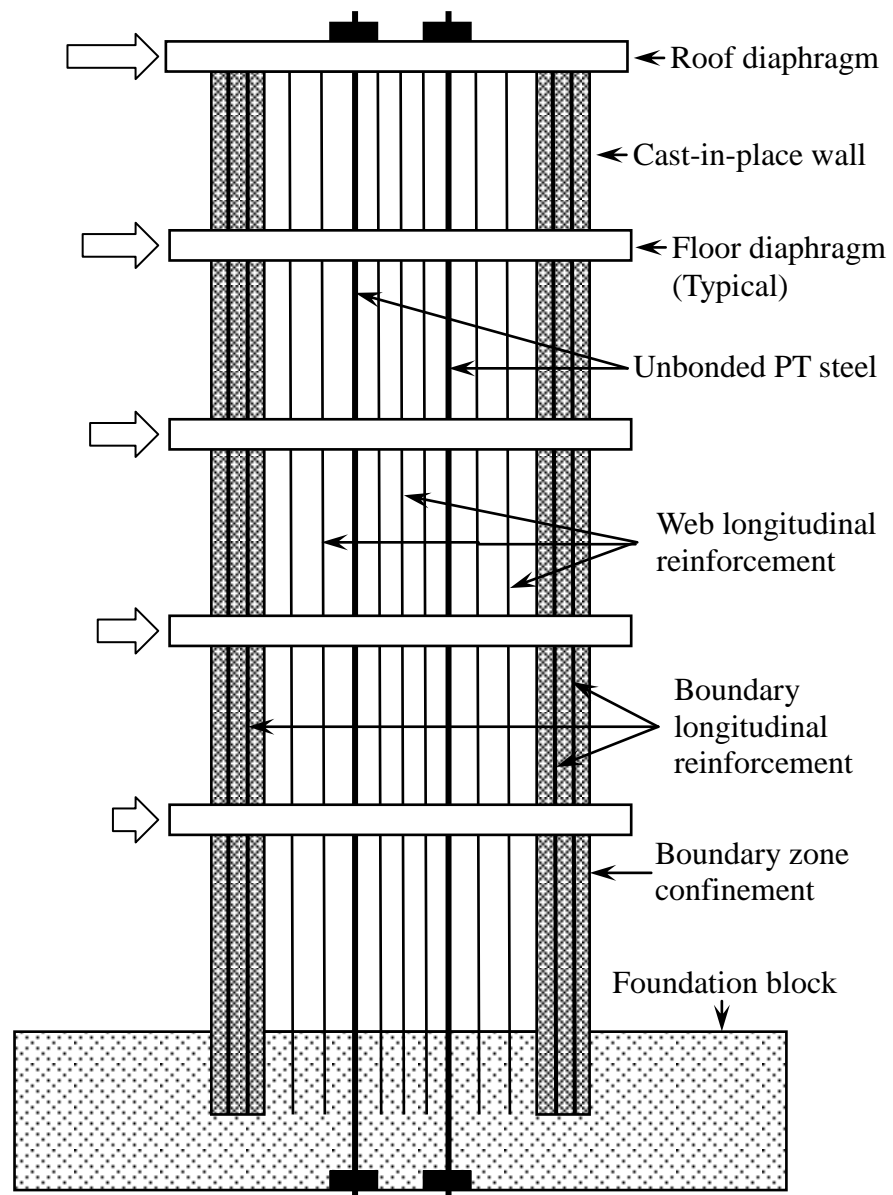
Unbonded PT CIP concrete special wall subjected to lateral loading
